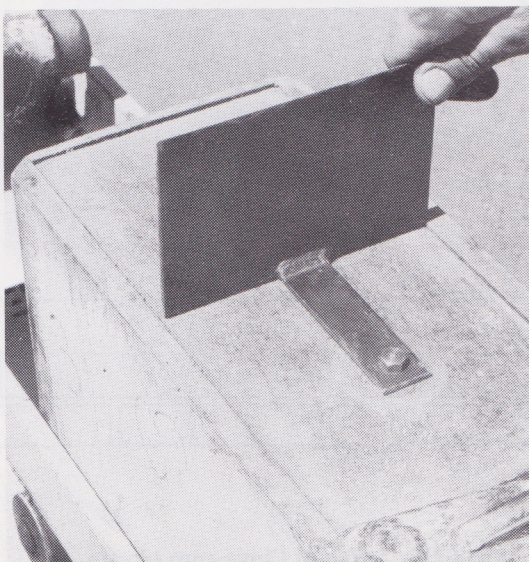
Cutting attachment for the Cinva-ram for casting half blocks
